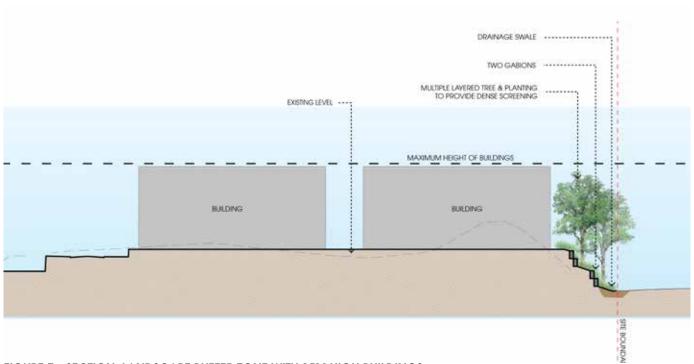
SECTION, LANDSCAPE BUFFER ZONE WITH 15M HIGH BUILDINGS
